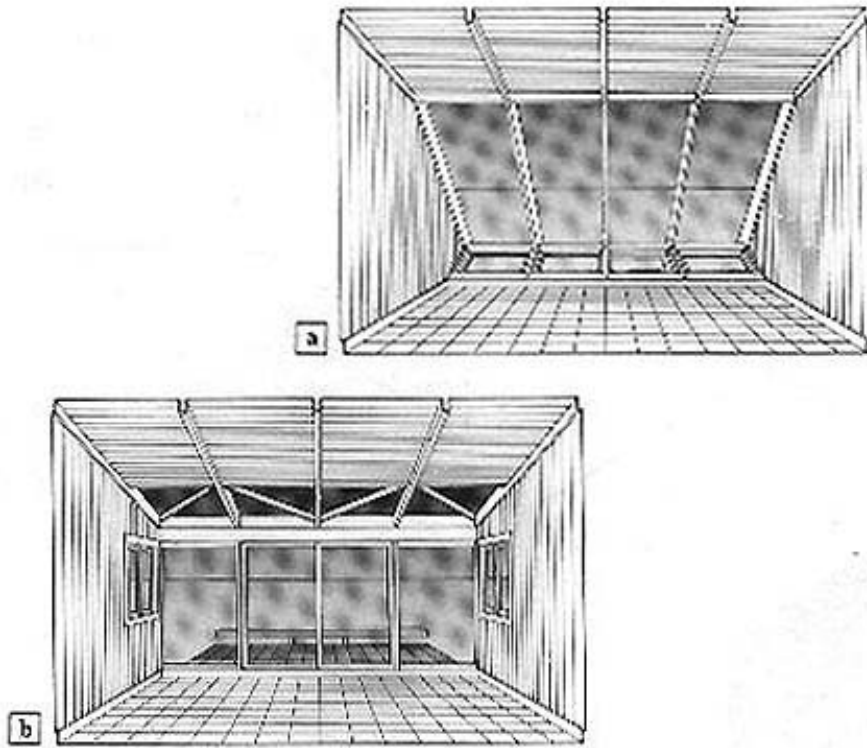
Sunspace with sloped south-wall glazing over reverse-slope vent windows (a). Sunspace with vertical south-wall glazing (sliding door), side venting windows, and sloped roof glazing (b). (Design by Dennis Holloway, Architect)
